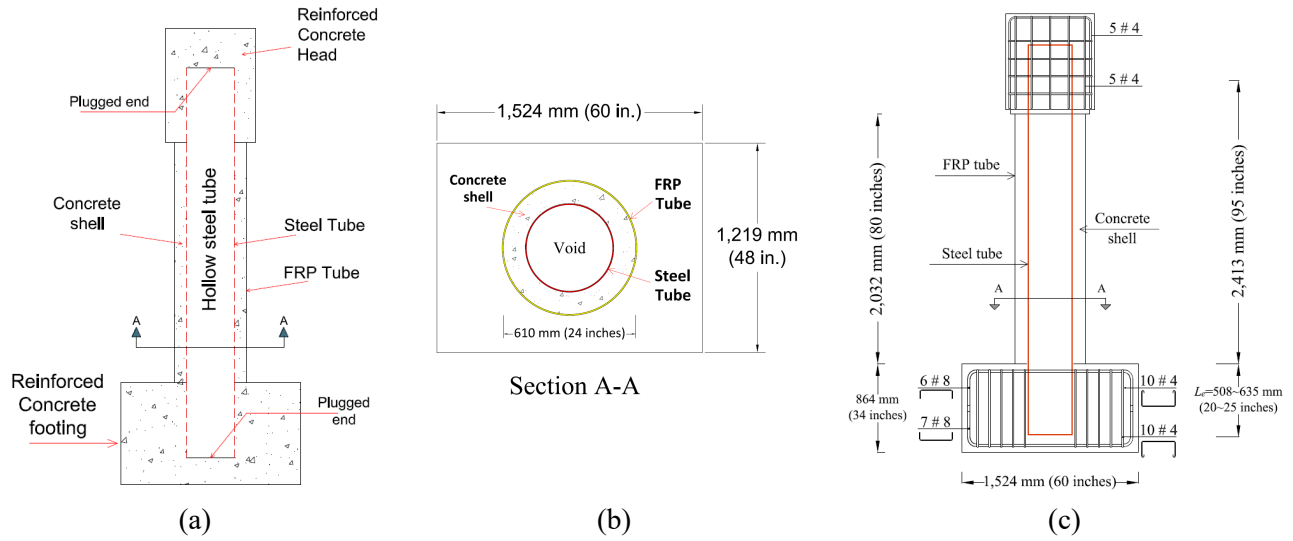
HC-FCS column (a) general assembly, (b) cross section, and (c) layout
